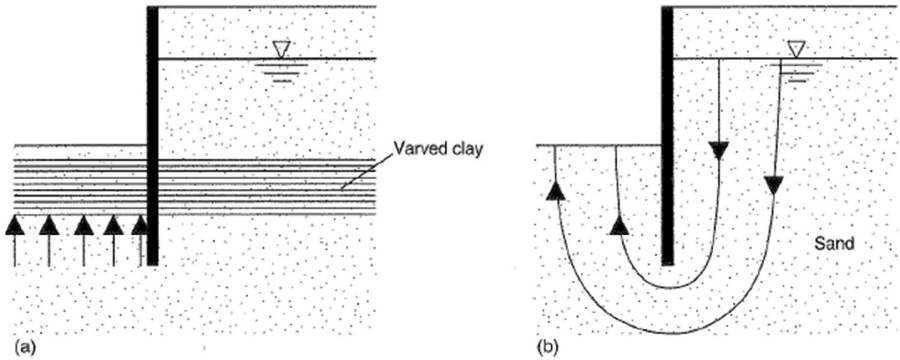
Examples of hydraulic failure mechanisms due to different soil conditions: (a) failure by uplift and (b) failure by heave (Frank et al. 2004).
